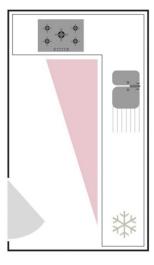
Layout Plan of L-shaped Kitchen
